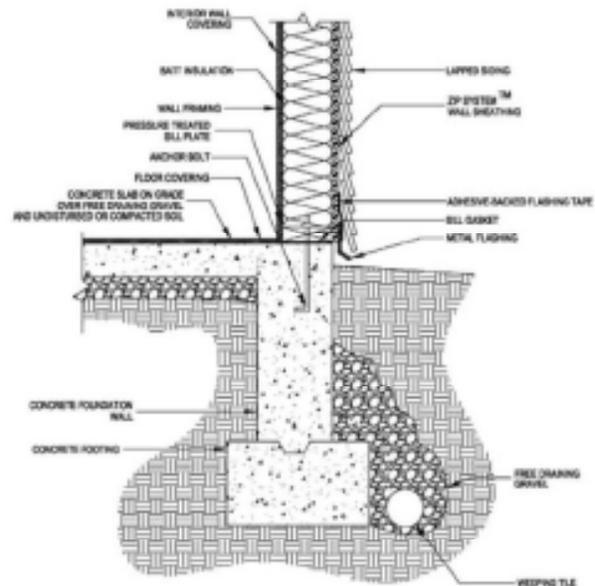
TYPICAL WALL-SILL INTERSECTION AND FLASHING DETAILS FOR LAPPED SIDING
